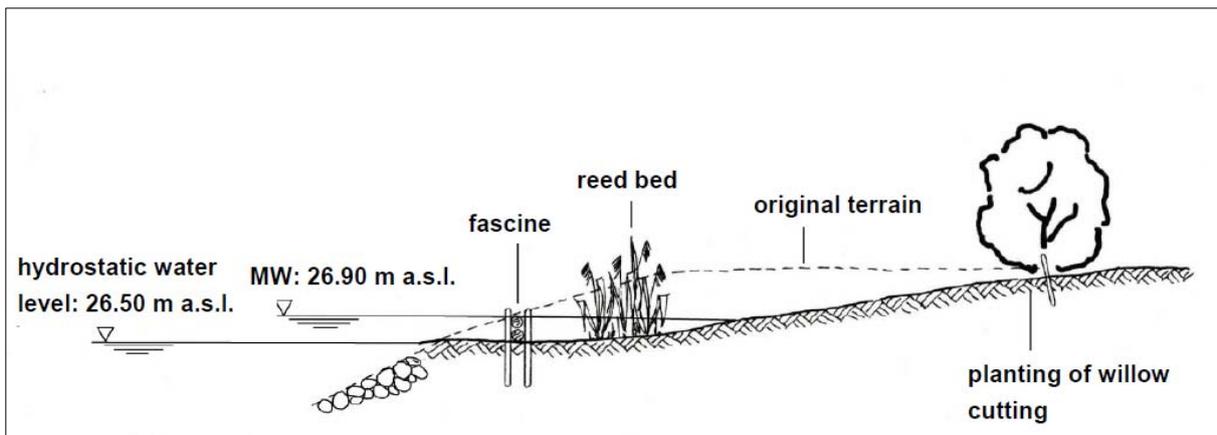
Reconstruction of the bank by flattening of the bank slope: profile of Section 9 (from original plans)
